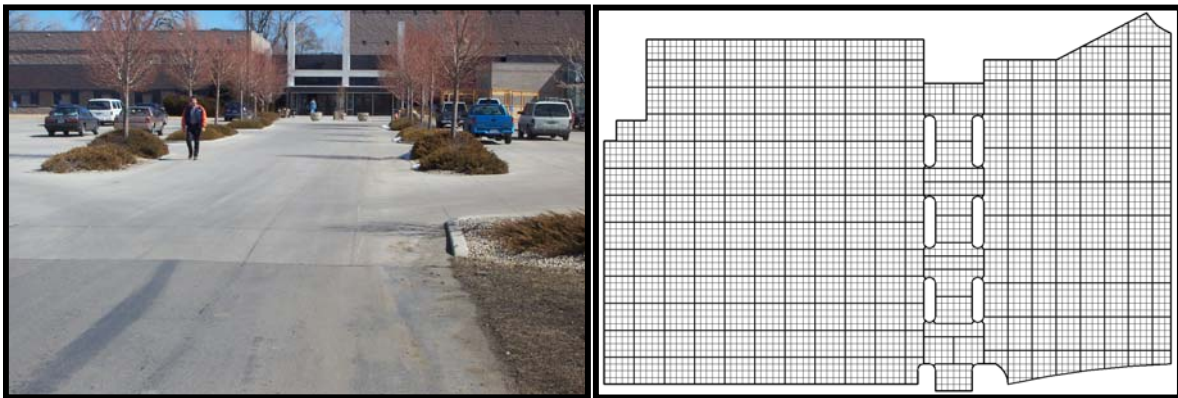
View and parking lot layout of the Life Bridge Christian Church.
